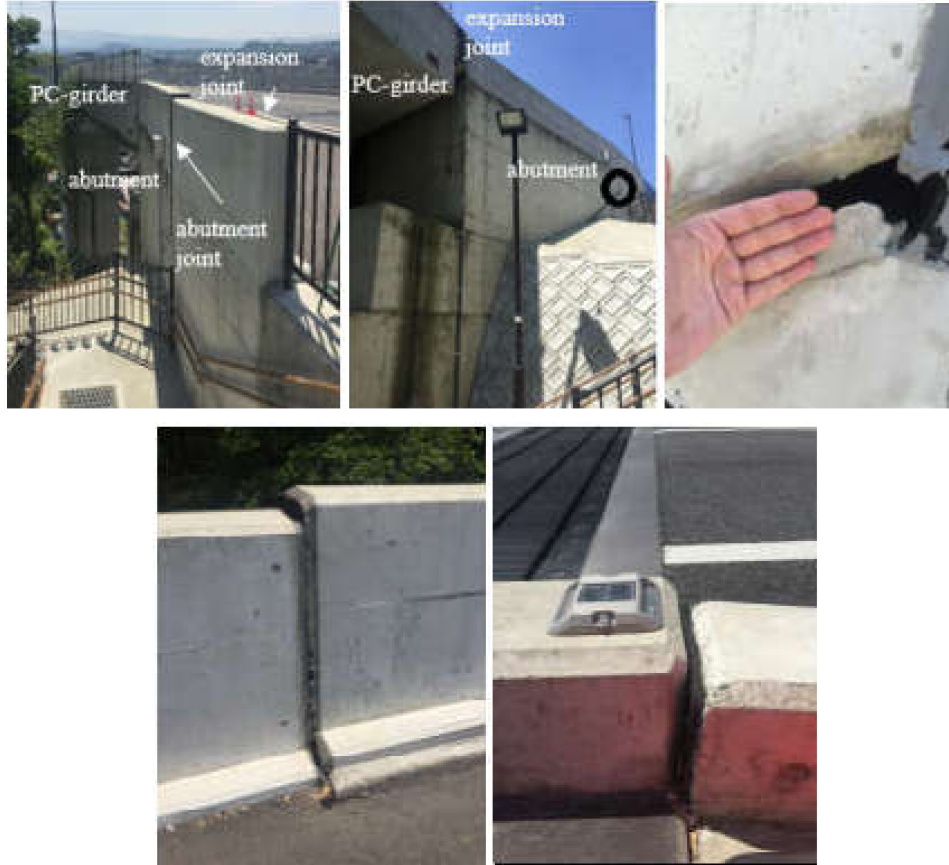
Side view of abutment and observed crack at the abutment joint of the PC-box girder bridge
